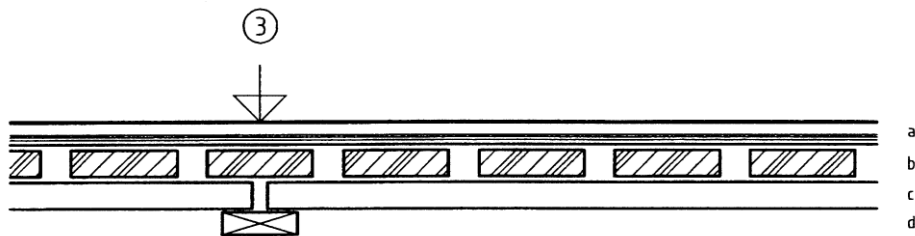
Surface-elastic floors with elastic construction (with one sprung beams layer and non-staggered supports)
